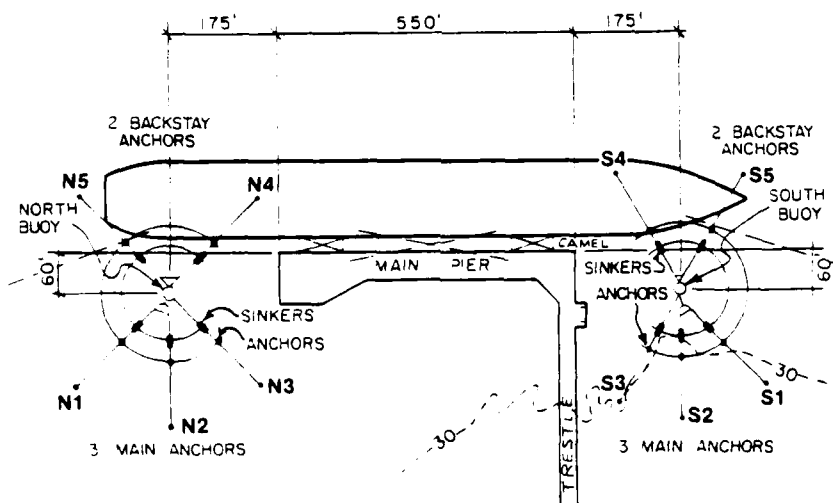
POL PIER MOORING SITE LAYOUT
